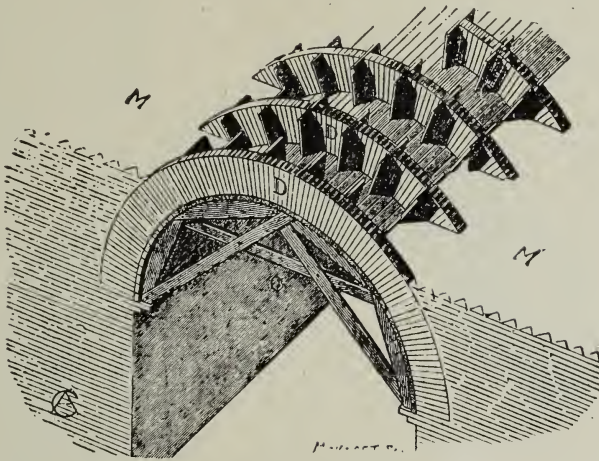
Roman Method of Brick-and-concrete Vault Construction.
